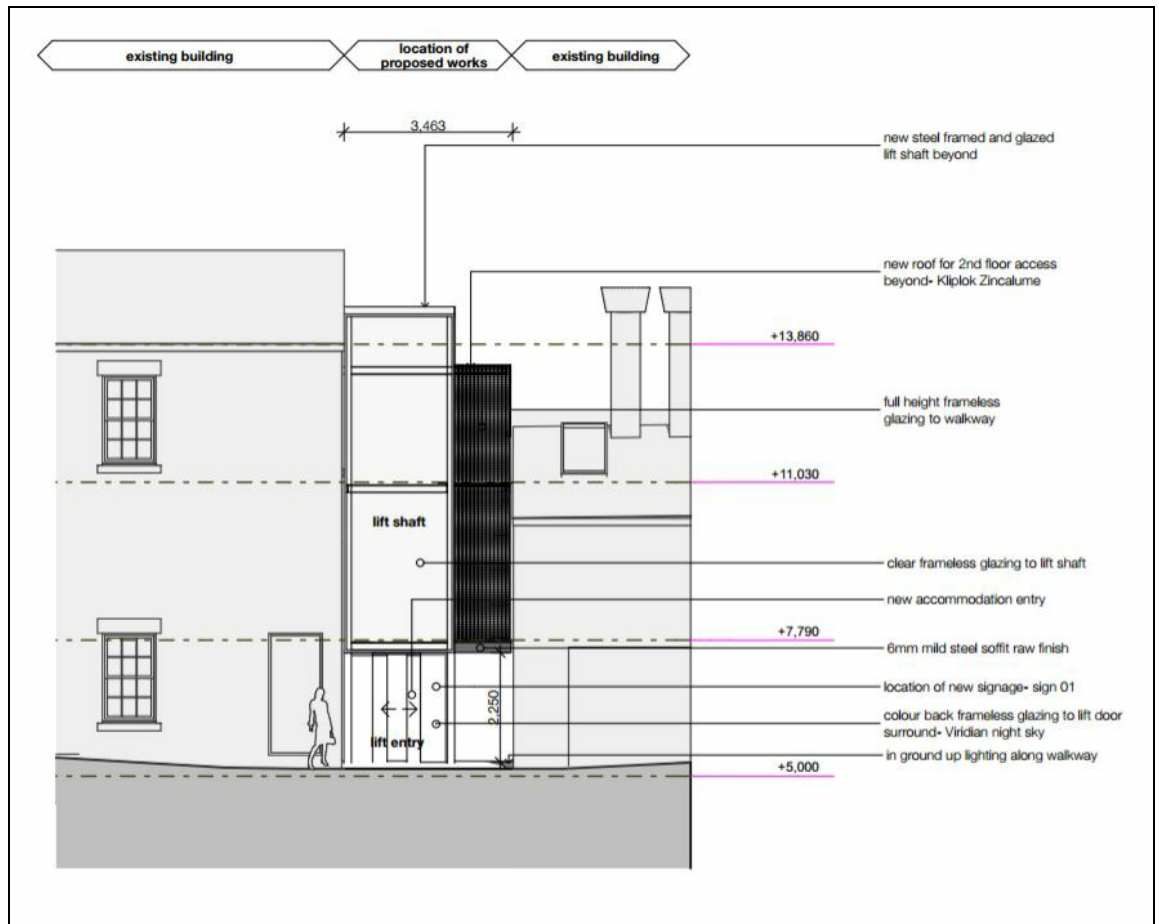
The Kennedy Lane elevation of the proposed works to 47-51 Salamanca Place.
